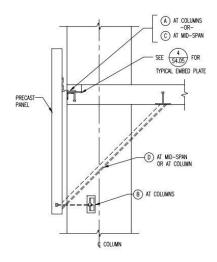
Precast Elevation Detail - by Cagley and Assoc.
